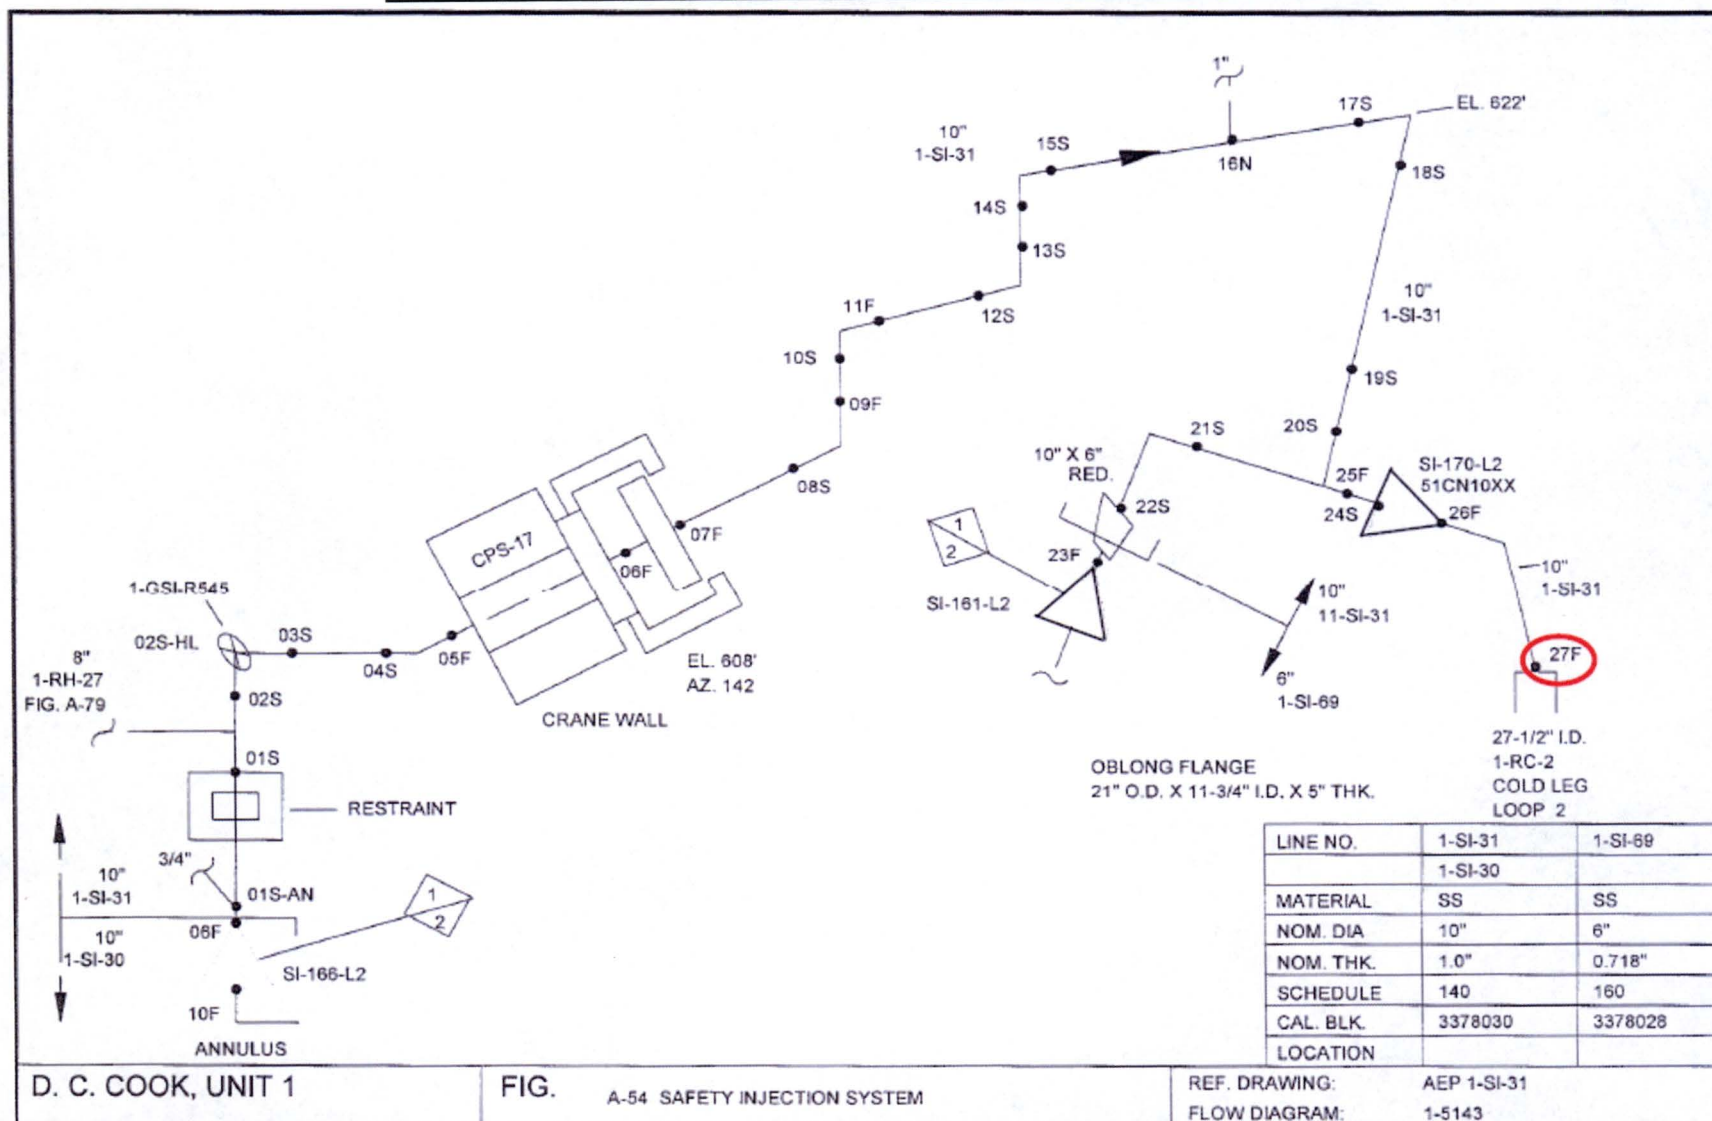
Weld 1-SI-31-27F (Extracted from Reference DRAWING A-54)
